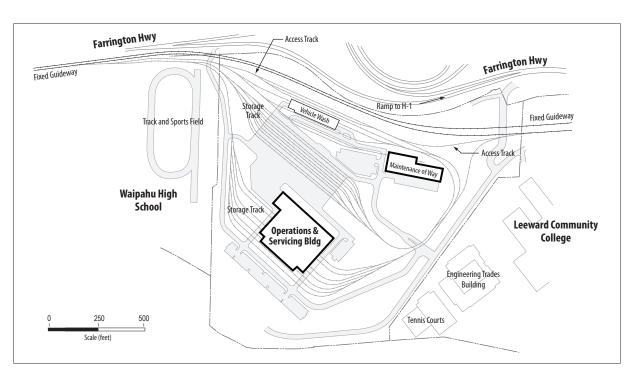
Leeward Community College Maintenance and Storage Facility Location and Conceptual Layout
